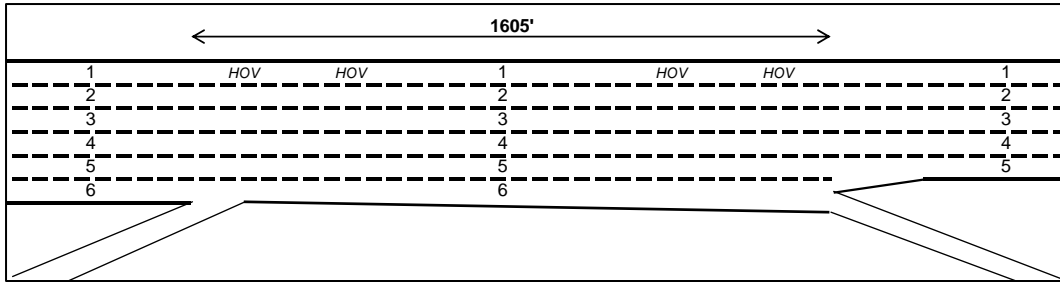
Site 1: I-80EB; Powell St to Ashby Avenue, Emeryville, CA
